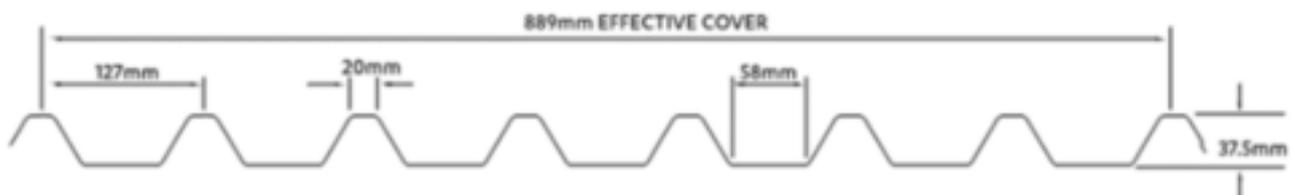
Alternative acceptable profile - Steel and Tube ST7 profile (shown opposite to installed orientation)
